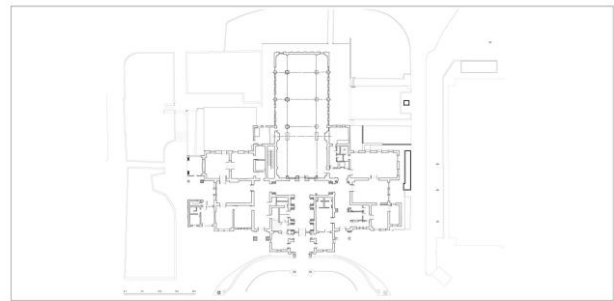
2D drawing of Ground floor plan of the building obtained from the SLAM point cloud through section extraction in PointCab and vectorized in AutoCad
